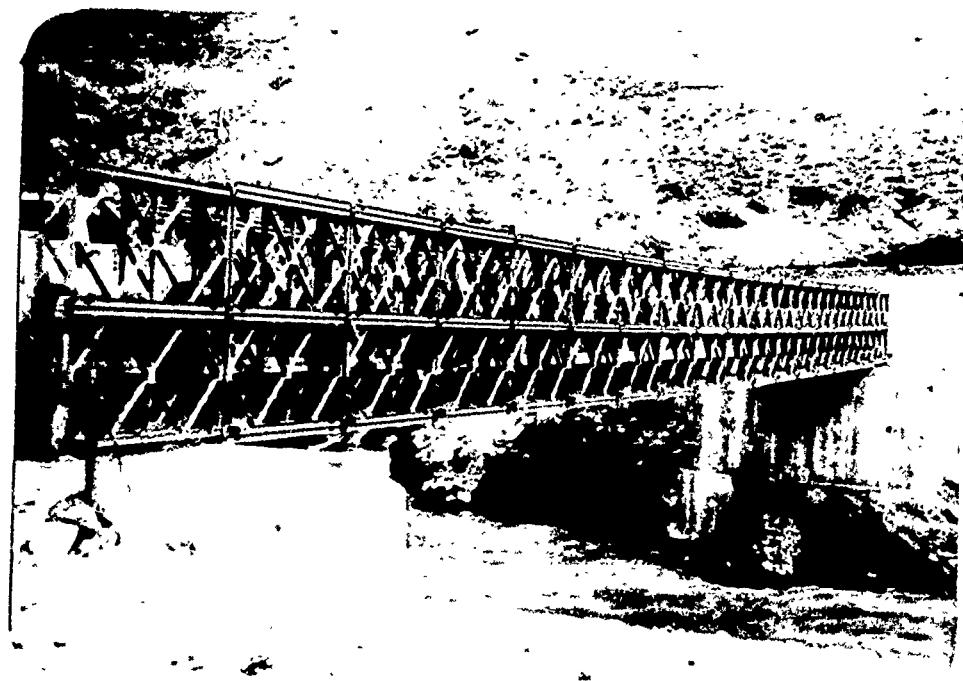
Another view of upstream of the structure looking from left abutment to right abutment
